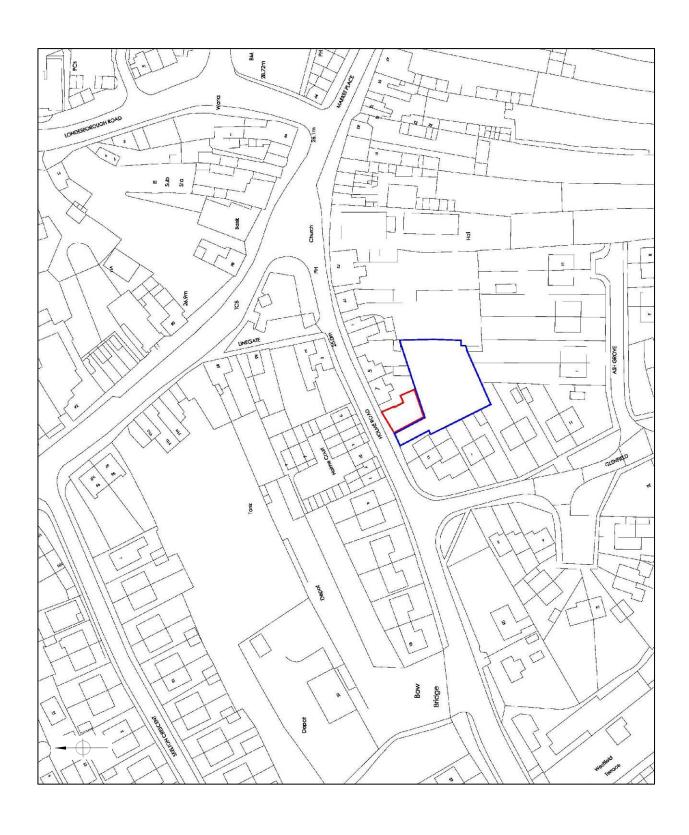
SITE LOCATION (not to scale - plan supplied by Sangwin Architects)
